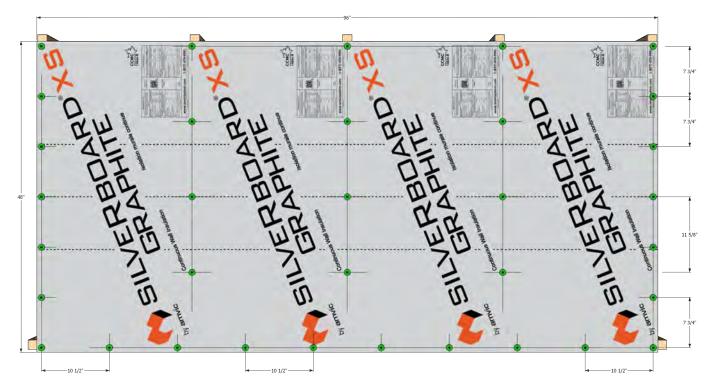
Horizontal nailing pattern at 24" (610mm) o.c. studs (34 cap nails)
